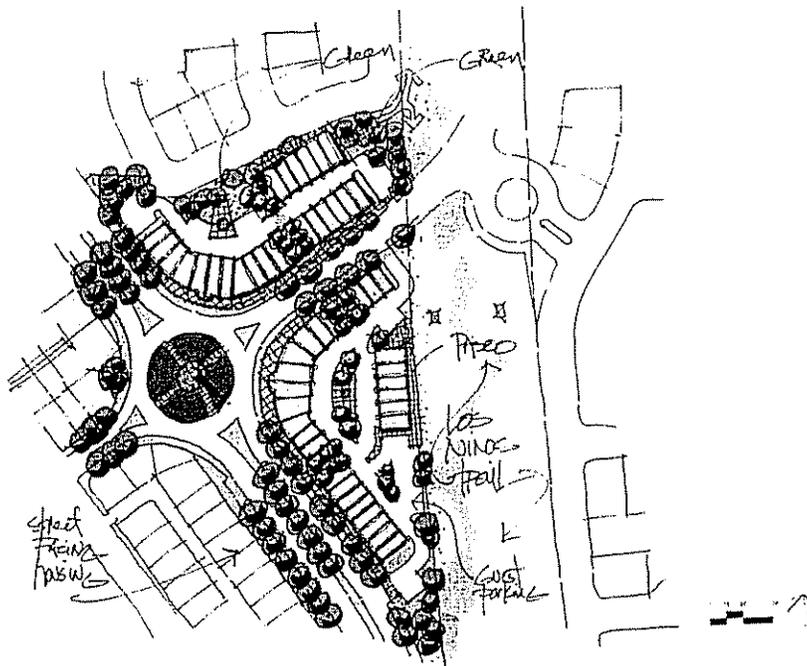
Schematic Live-Work Development Plan (Planning Area 22).
